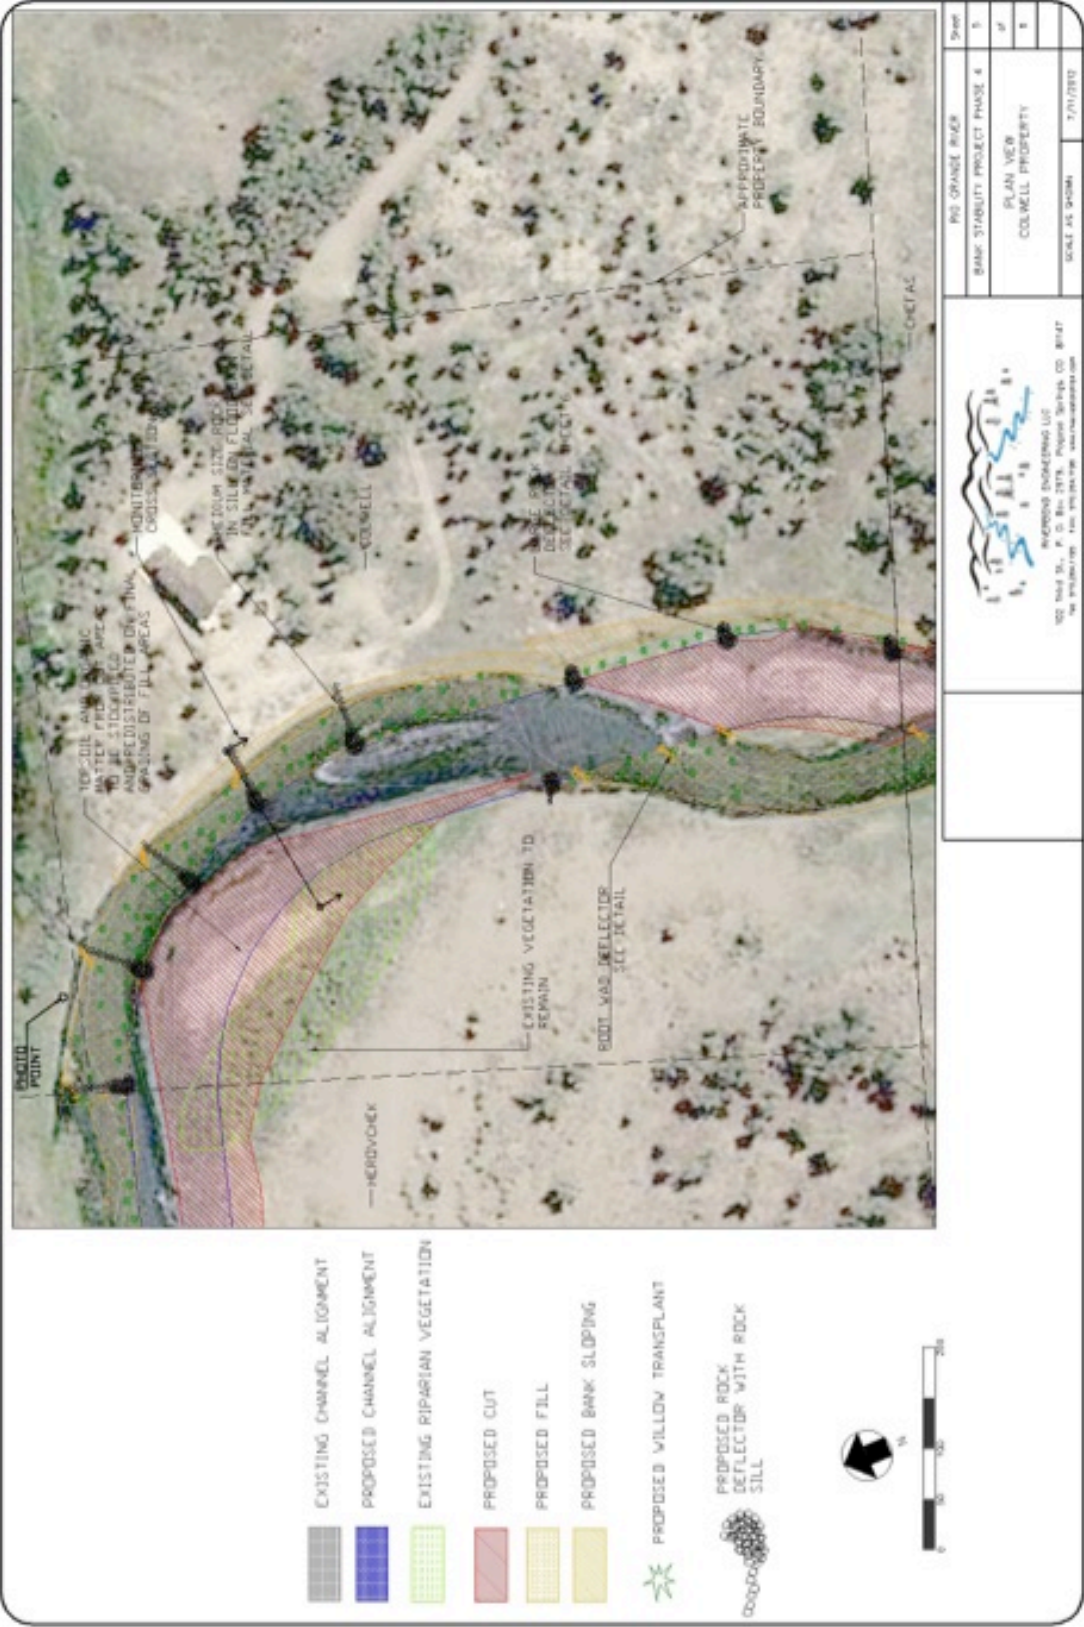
Site 4 Design, Cross Section Location, and Photopoint Location.
